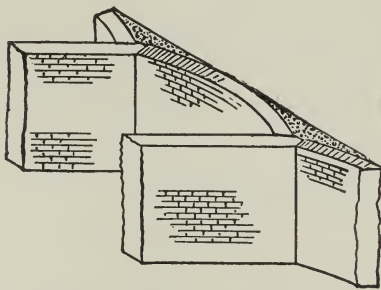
Arched Sidewalk Vault Walls with Partition Walls.
